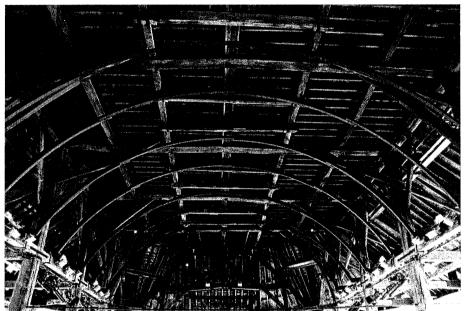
Exposed timberwork in ceiling of St George's Chapel
